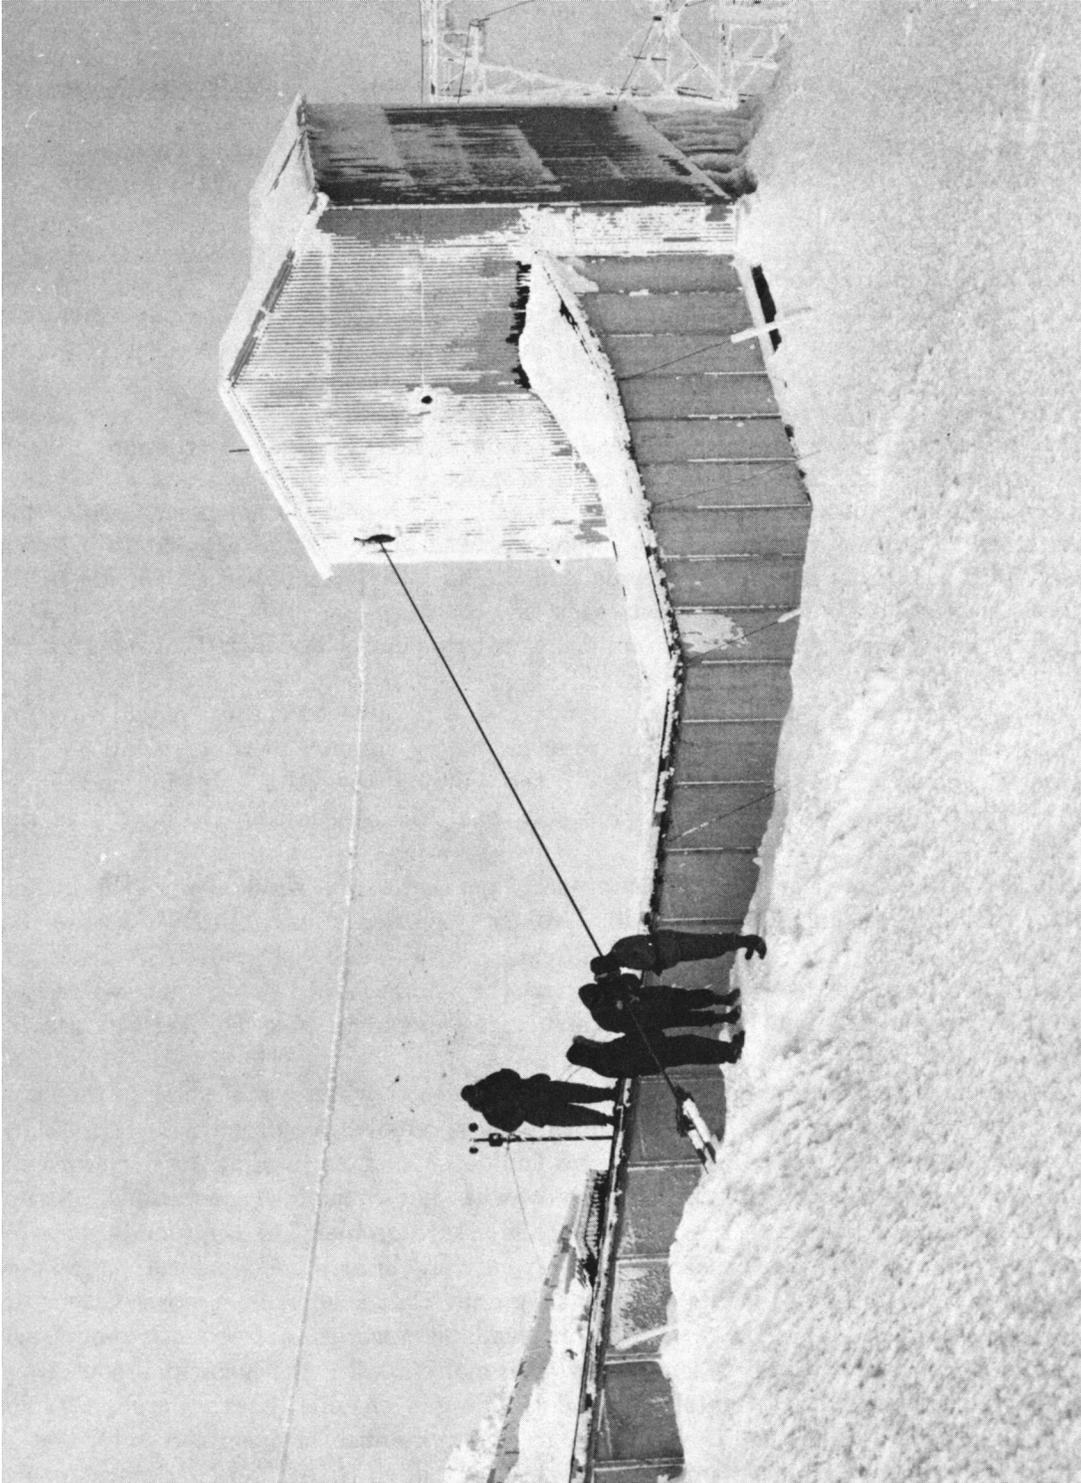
Covered walkway at Cape Newenham Air Force Station, Alaska (note the guys used to anchor the walkway against high winds).
